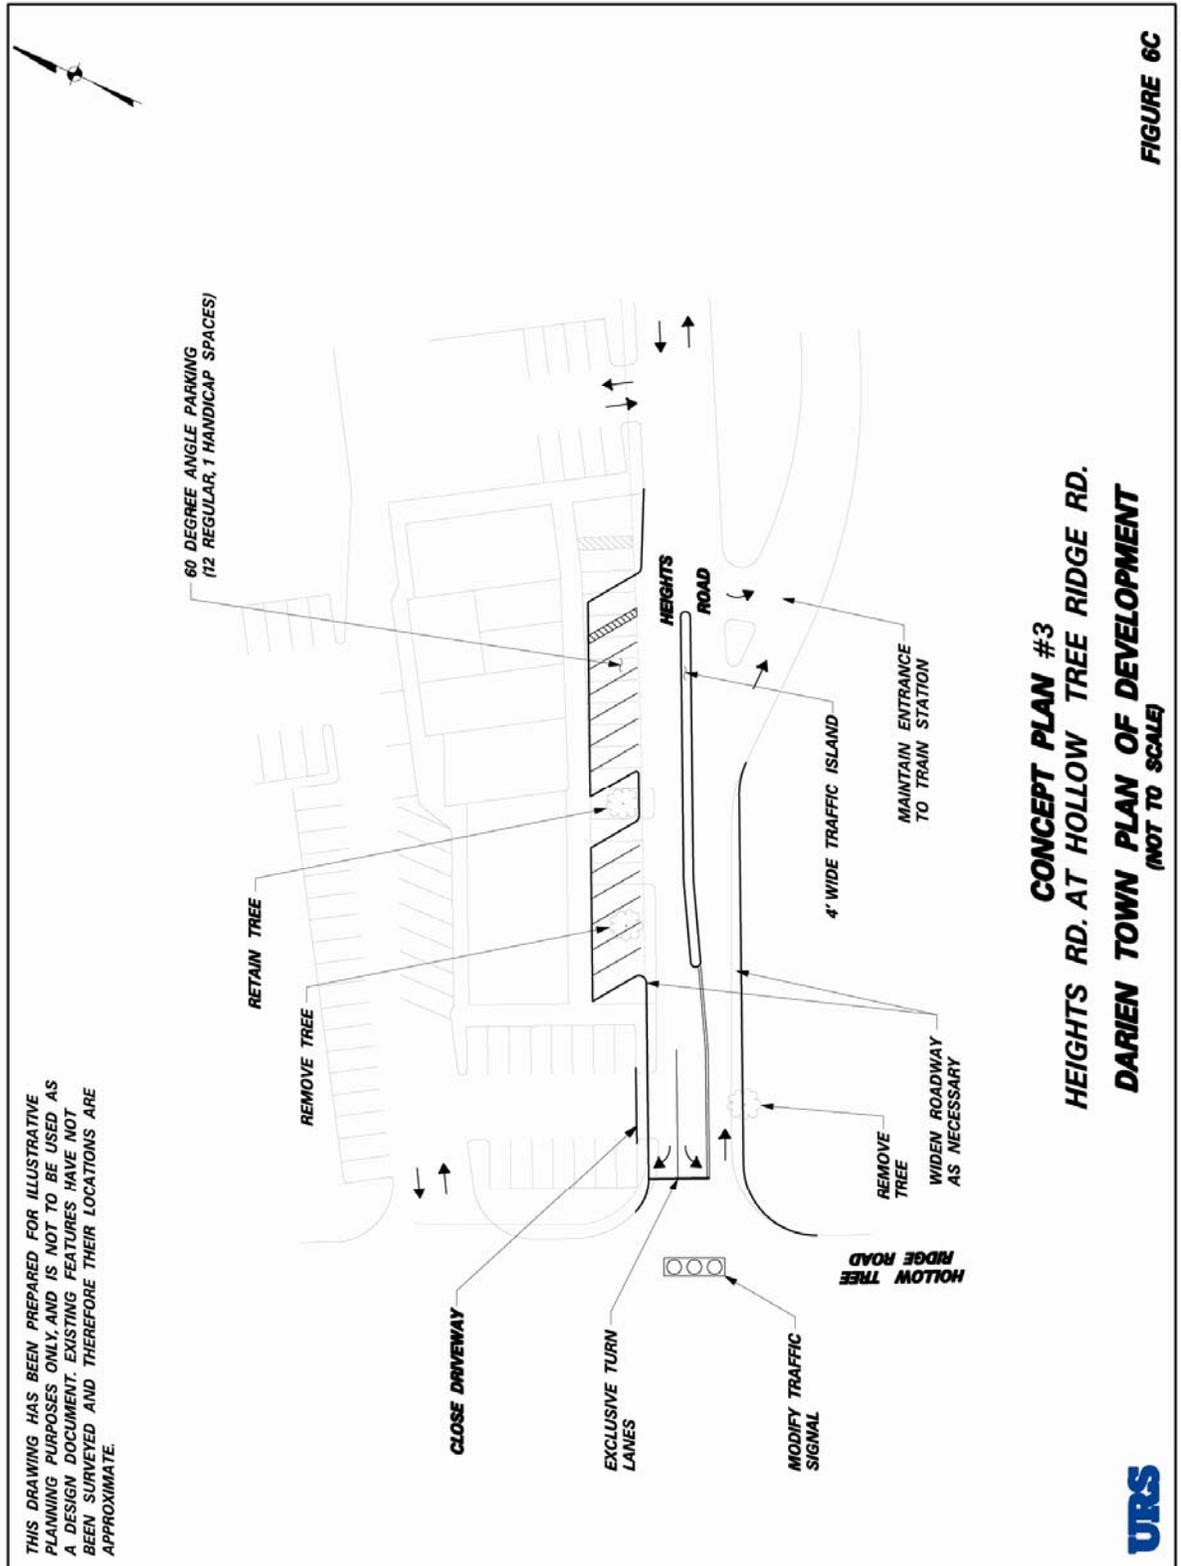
C CONCEPT PLAN – HEIGHTS ROAD/HOLLOW TREE RIDGE ROAD
